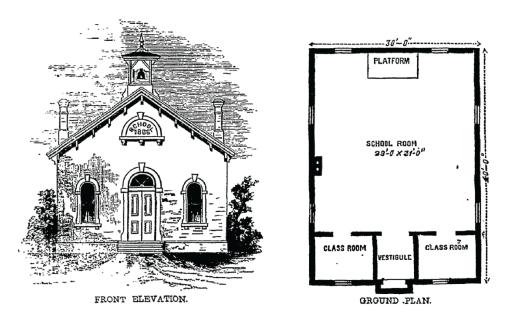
Selection of drawings from the 1866 The Canada Farmer column showing the suggested plan and principal elevation of the rural Schoolhouse being advertised (The Canada Farmer, June 15, 1866).
